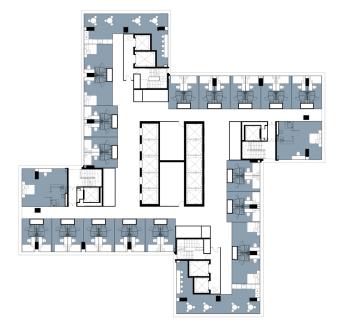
Typical tower level hotel test-fit for lower portion of stack. One lift bank doesn't open on to the hotel floors.
